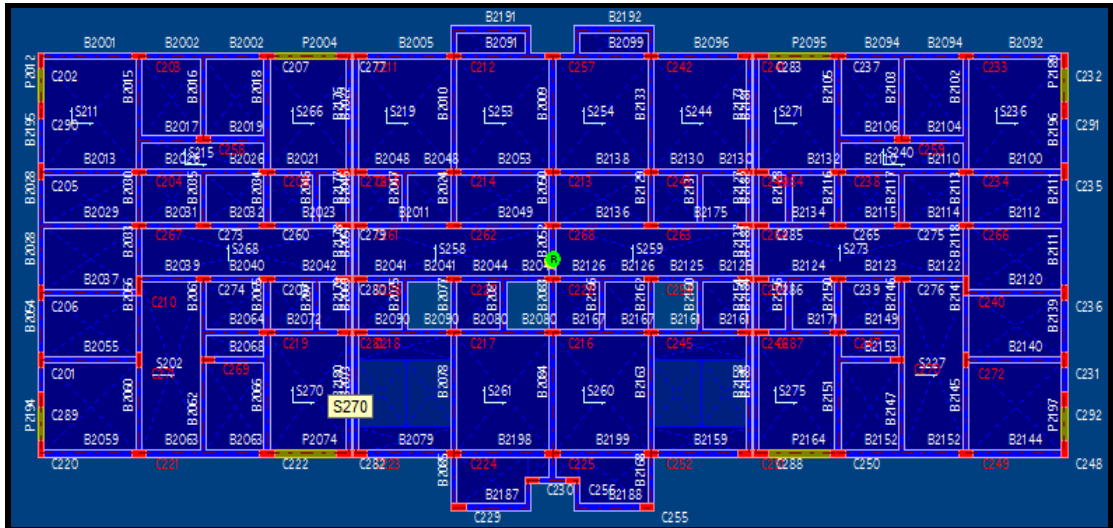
Plan of Buildings with Ten Stories and Shear Wall System
